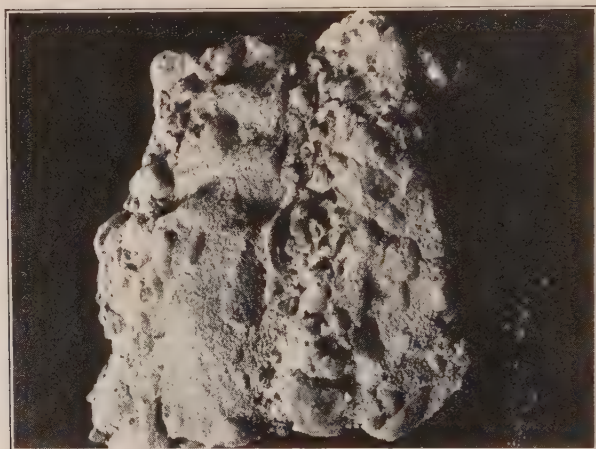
SPECIMEN OF POOR CONCRETE.
